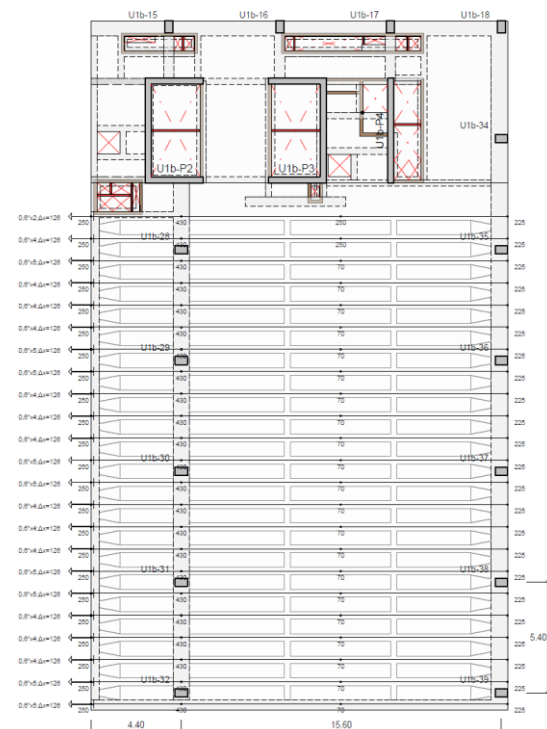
Mile Ávila post-tensioned long-spanned slab plan view (Provided by BIS structure)
